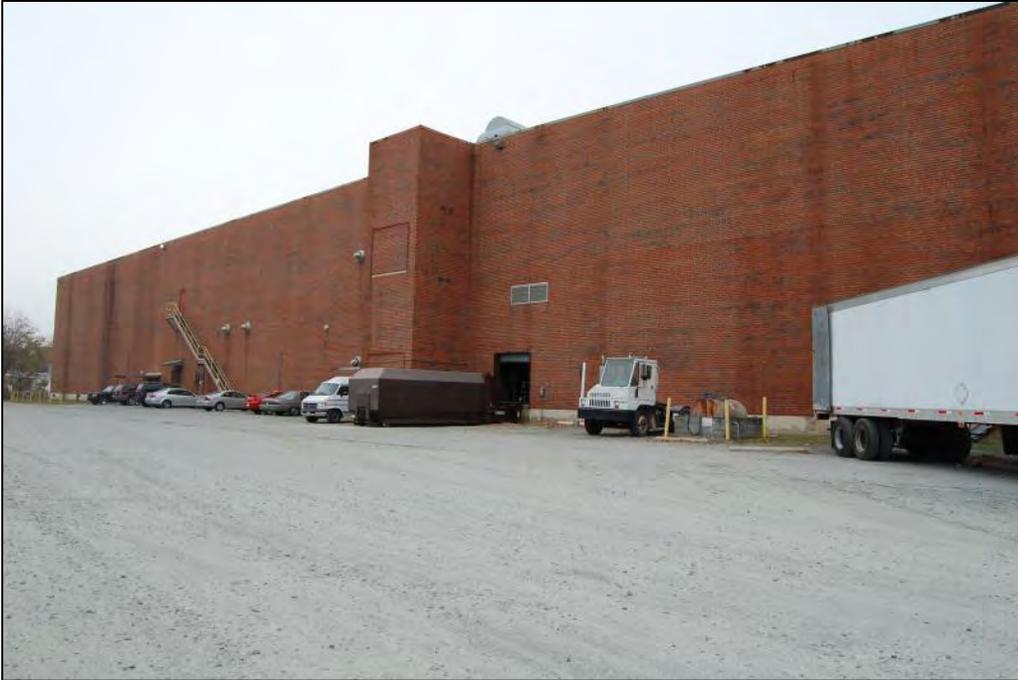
United Furniture Industries, south elevation of brick-veneered masonry building (1974)
